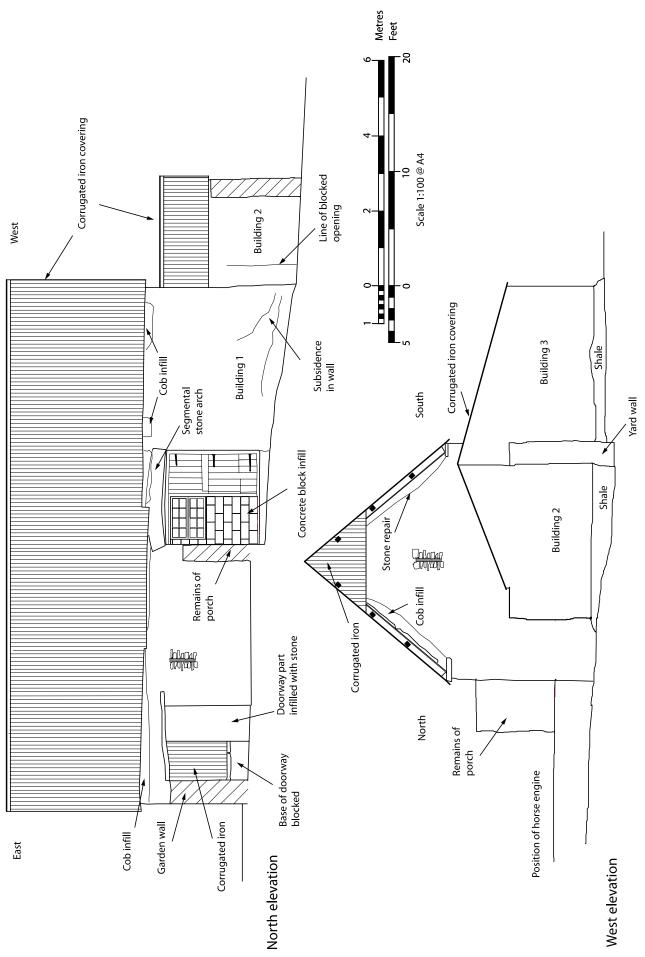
The Threshing Barn and attached buildings (Buildings 1,2 & 3), north and west elevations.
